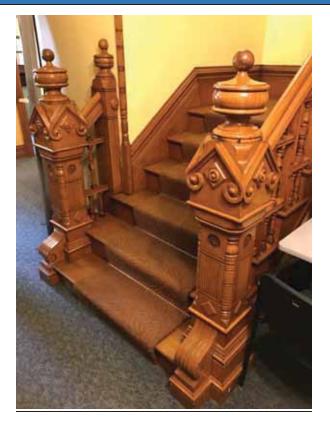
First floor woodwork (understood to be above predicted flood elevations)
